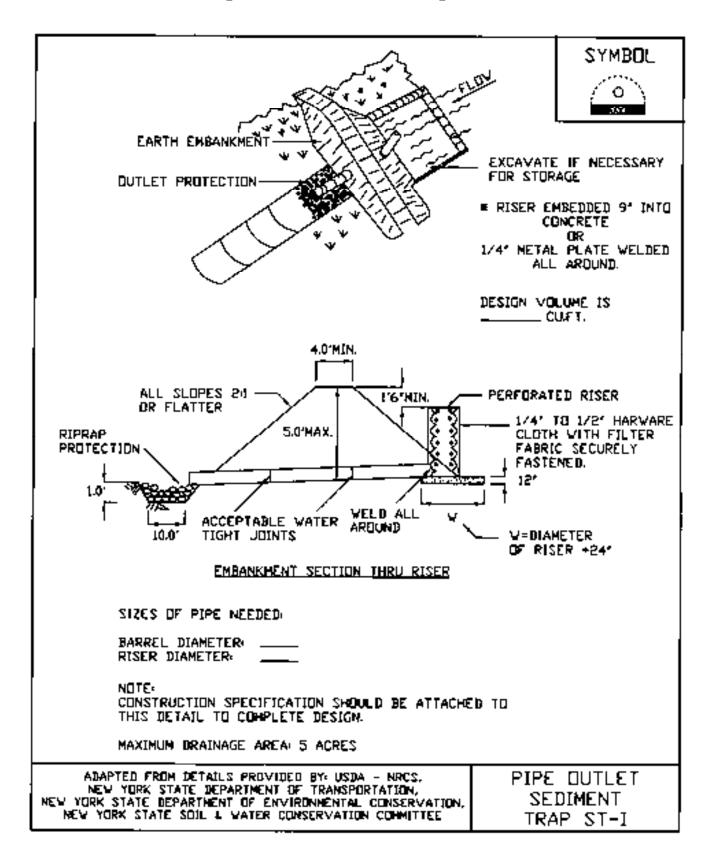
Pipe Outlet Sediment Trap: ST-I - Construction Specifications
